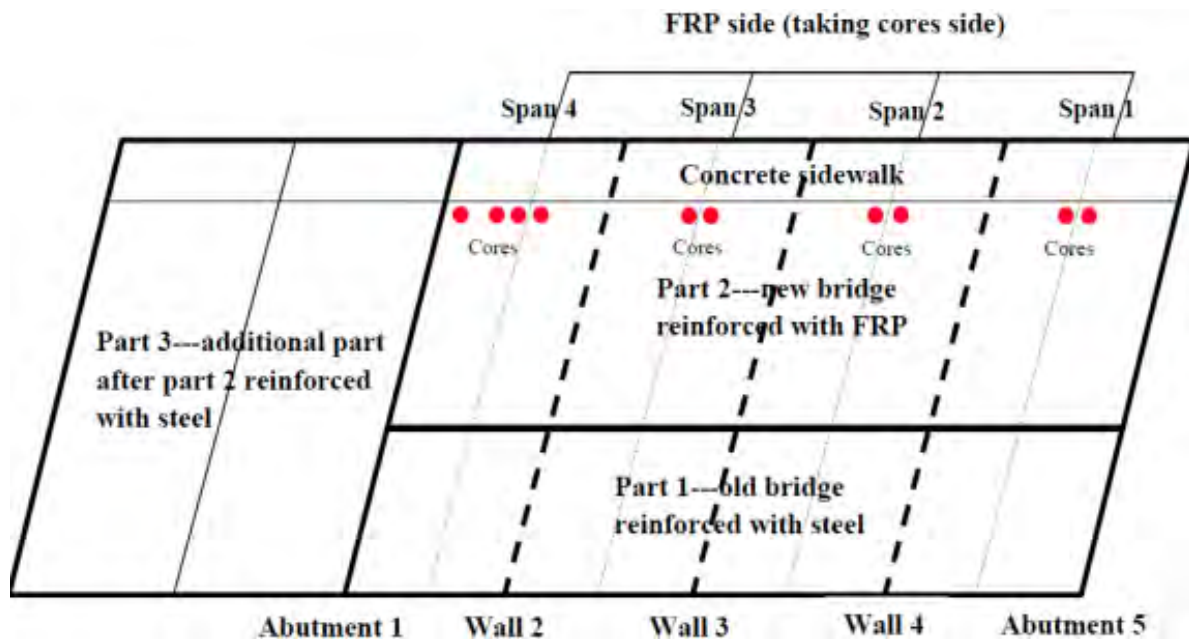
Southview Bridge location of extracted cores (Wang et al. 2018)
